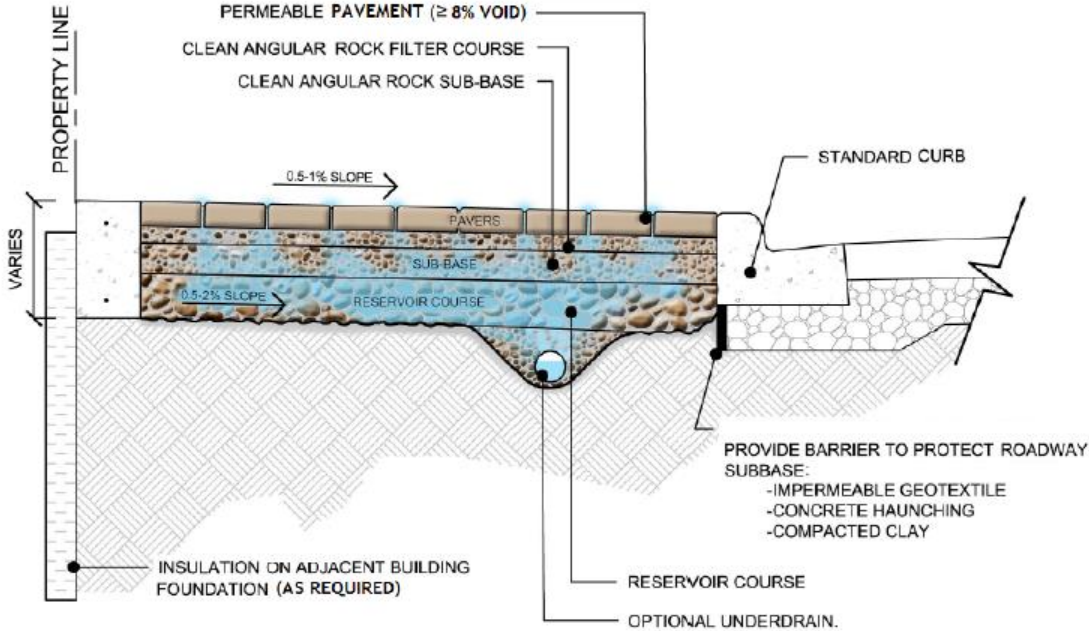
Permeable Pavement Cross Section (Drainage Services, 2014)
